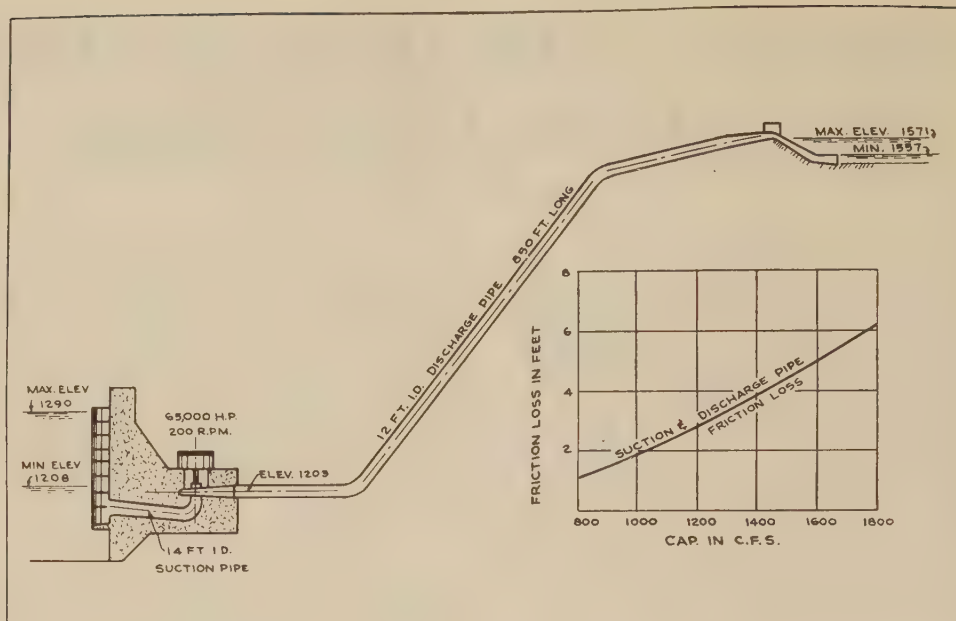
SECTIONAL ELEVATION OF GRAND COULEE PUMPING PLANT
